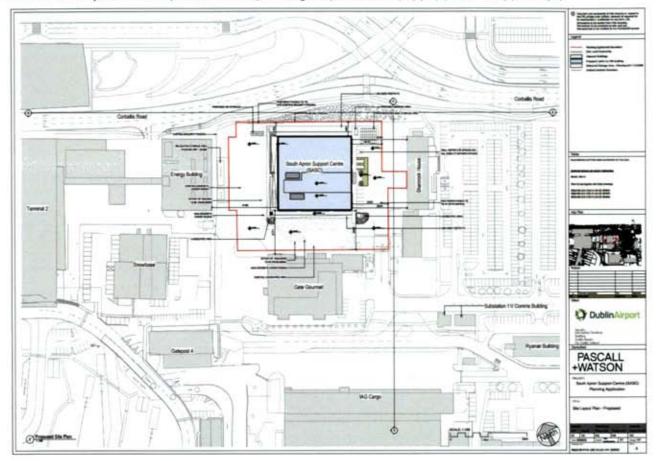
Proposed Site Layout Plan for the South Apron Support Centre
